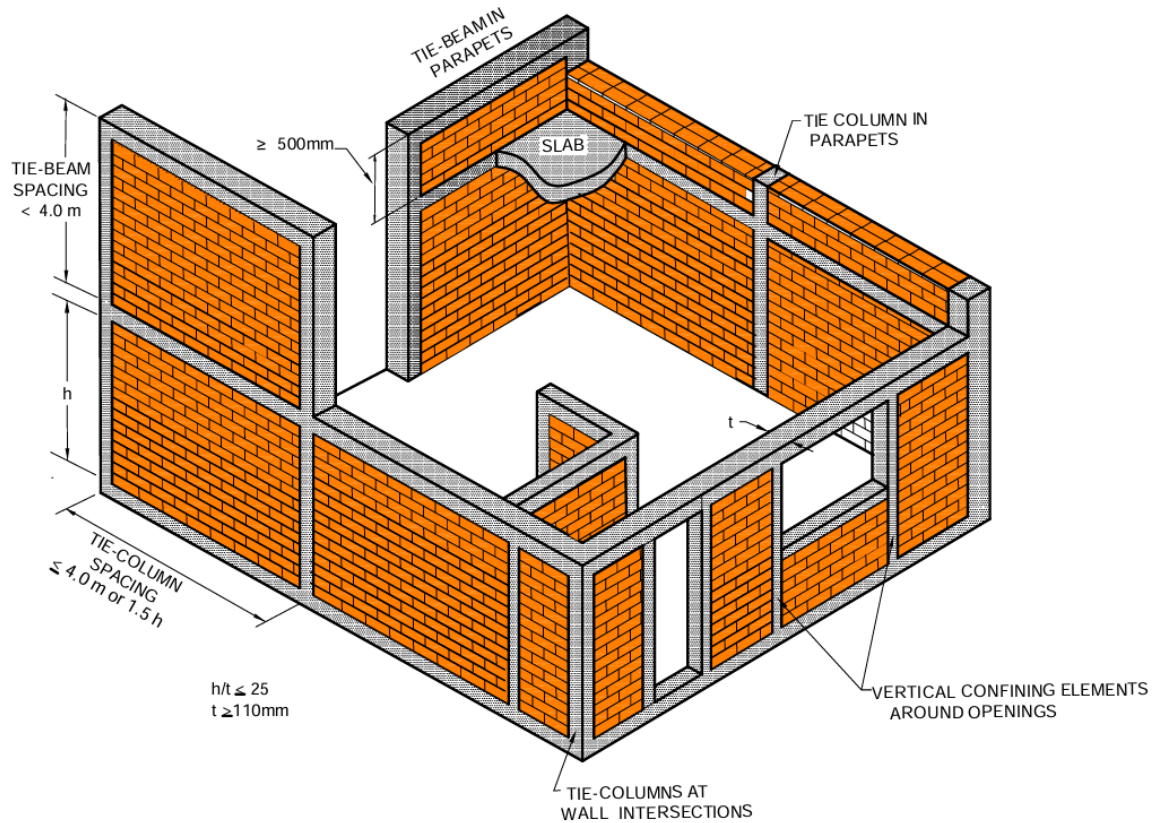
REQUIREMENTS REGARDING CONFINING ELEMENTS
